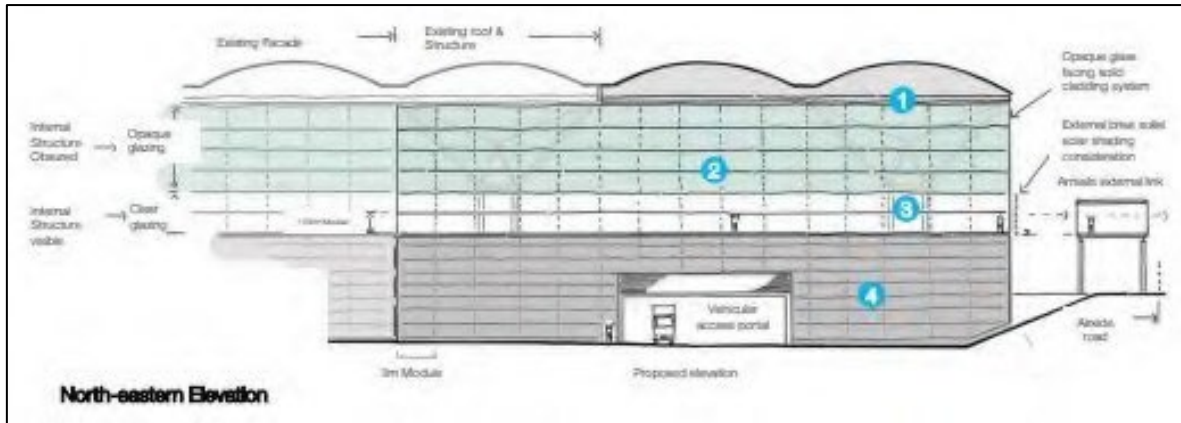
Proposed north-eastern elevation showing three-bay extension (MAG 2023)
